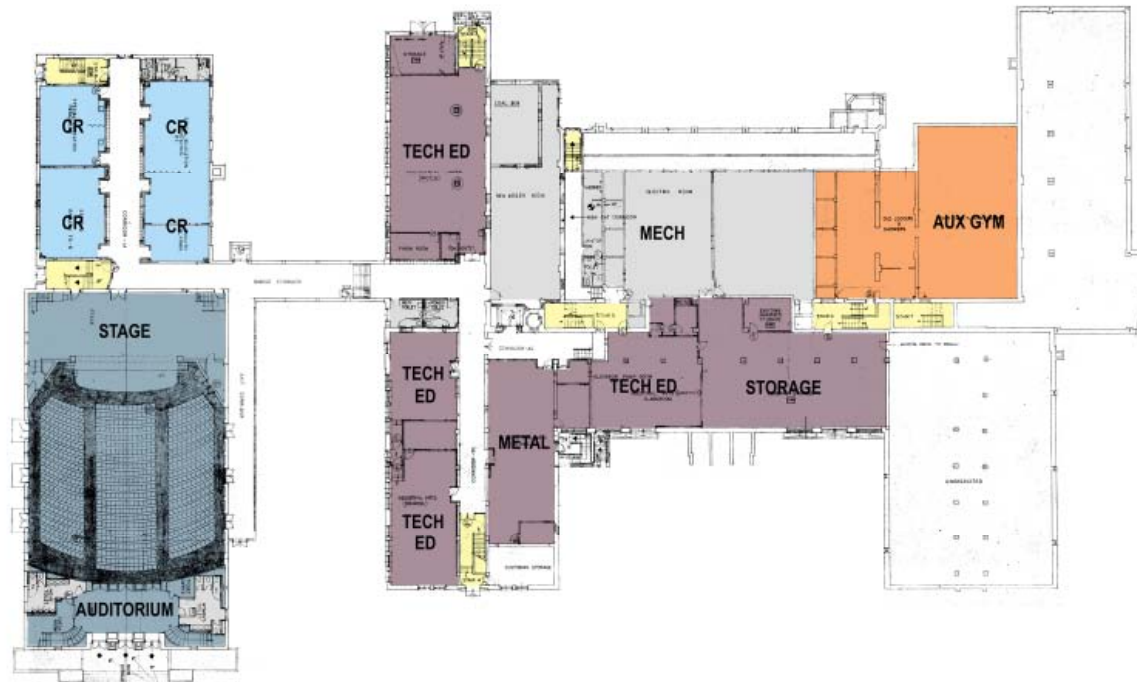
ALLEGANY HIGH SCHOOL AUDITORIUM ENTRANCE FLOOR PLAN
